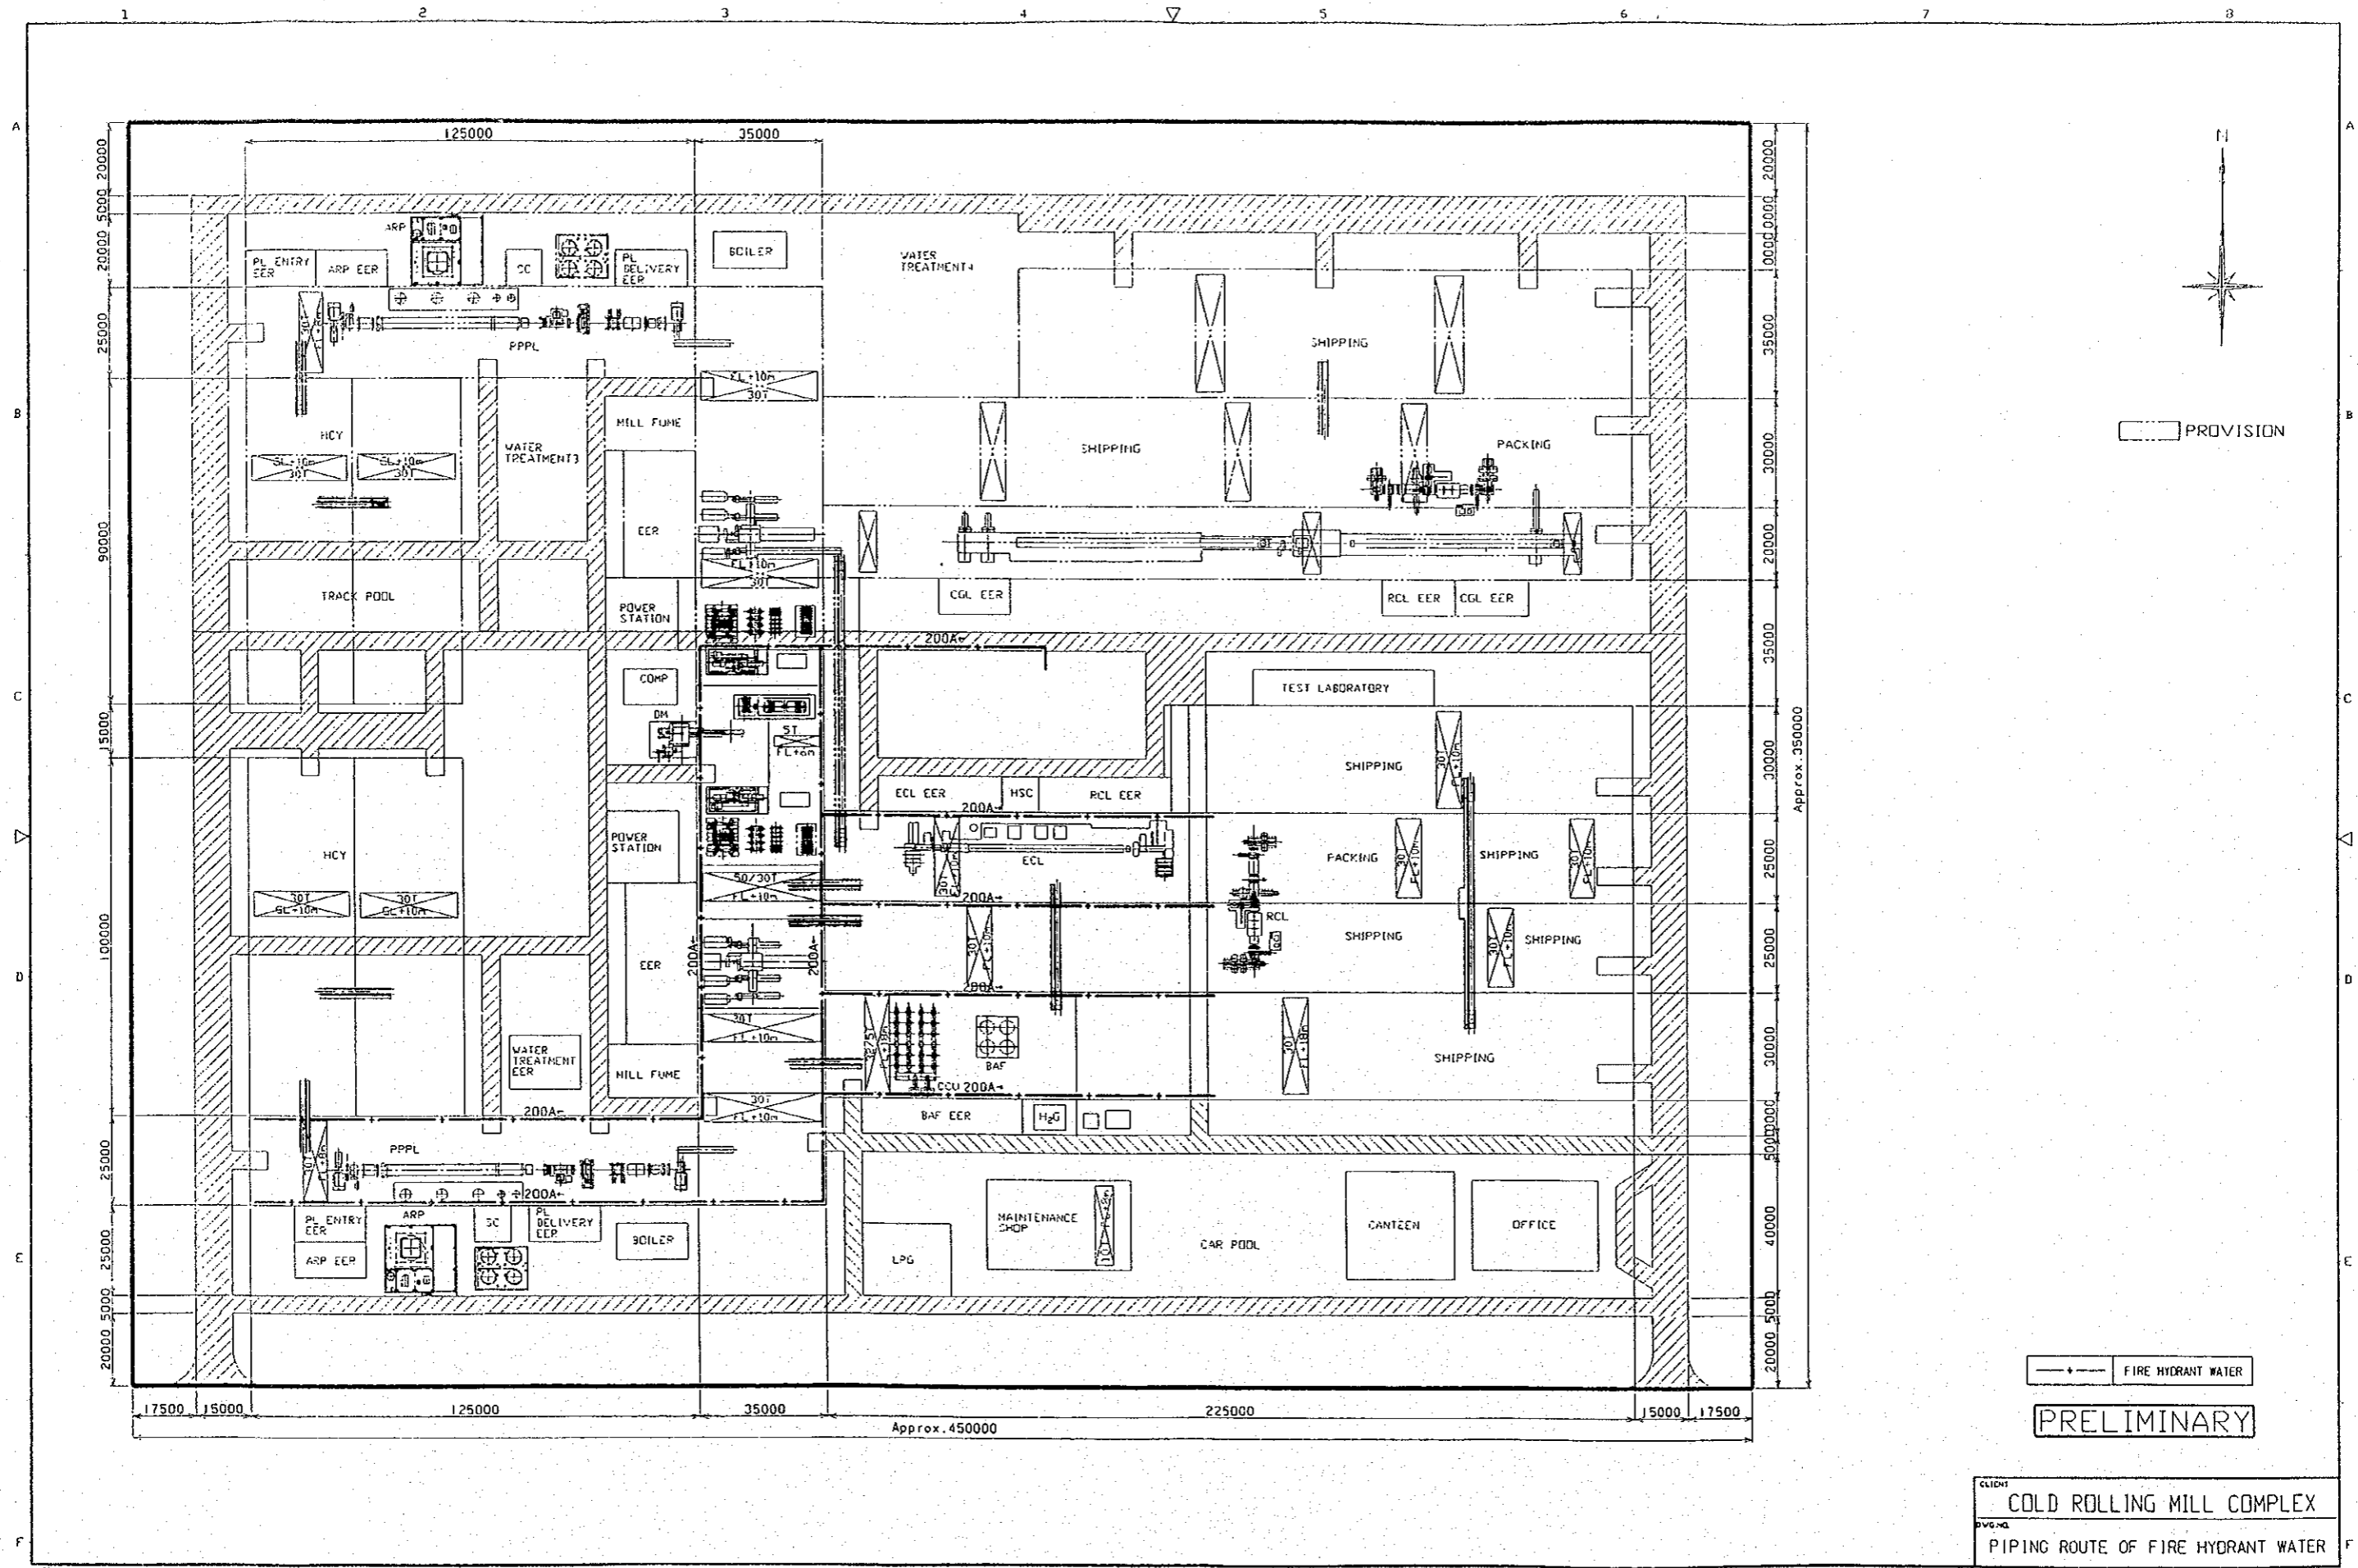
Piping Route Of Fire Hydrant Water
